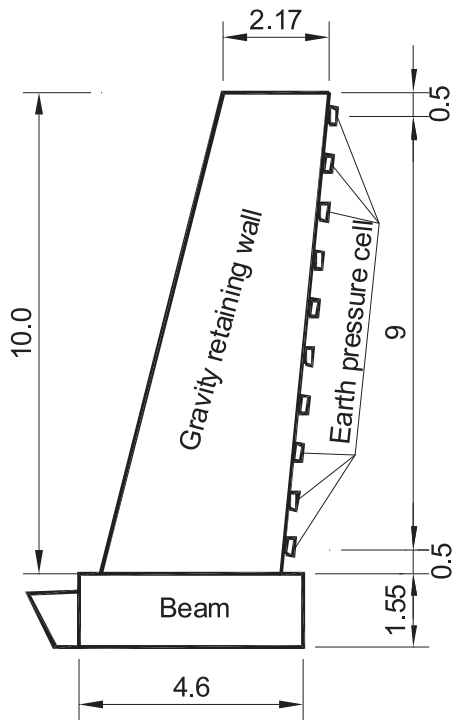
Arrangement of the earth pressure cells on the wall back (all units in meters).
